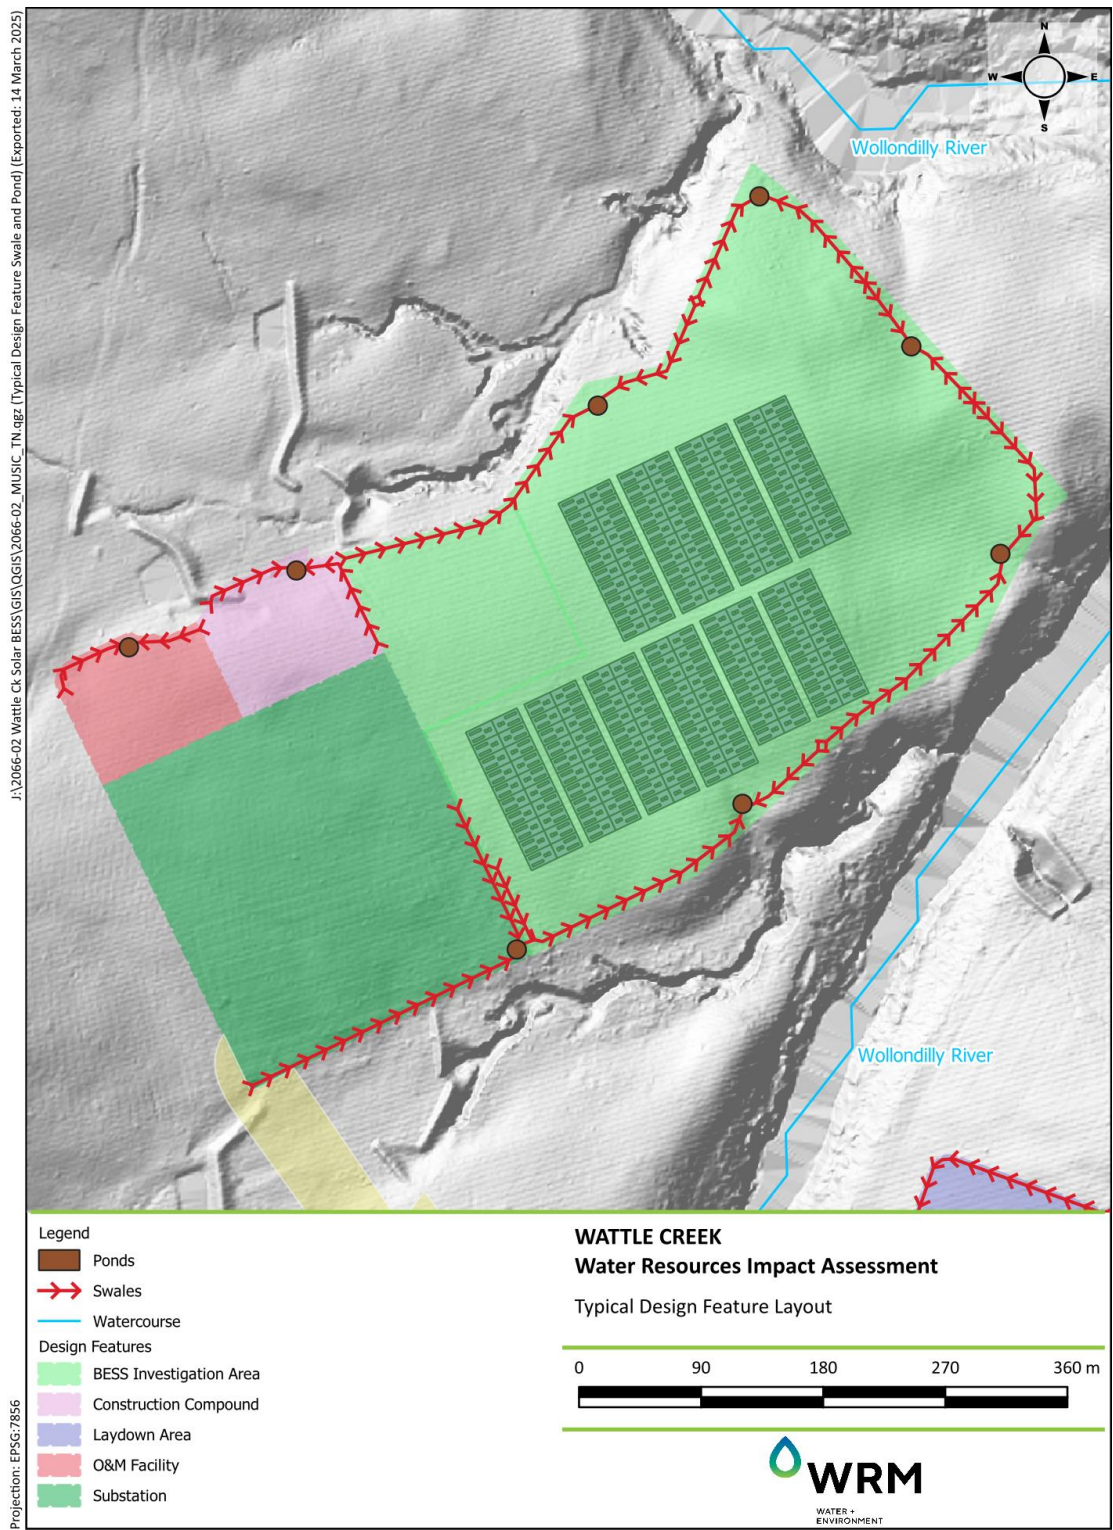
Typical Design Feature Swale and Pond layout 1
